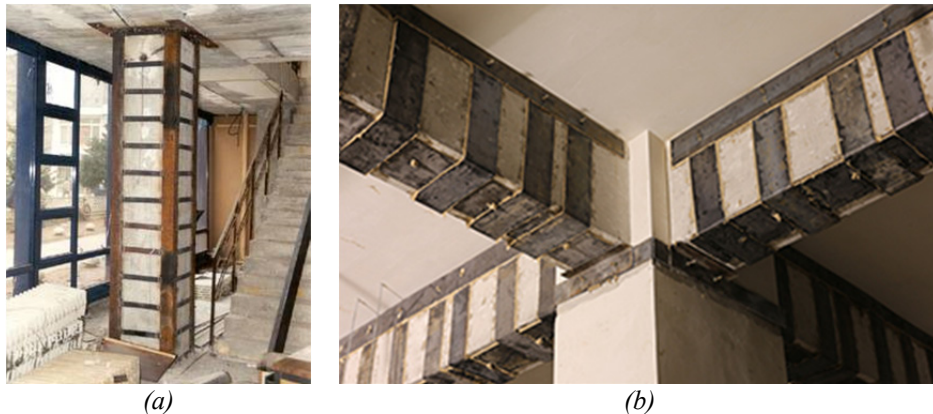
Example of steel jacketing of column (a); of beam elements (b)
